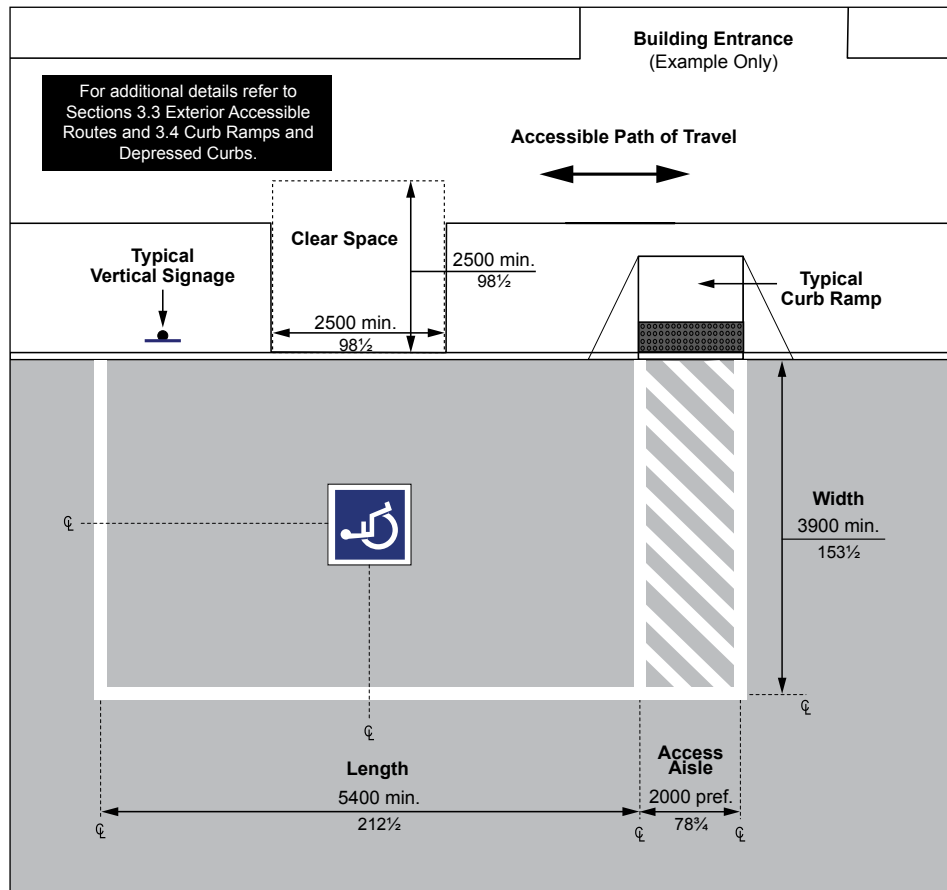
Perpendicular Accessible Parking Space Dimensions - Plan View
